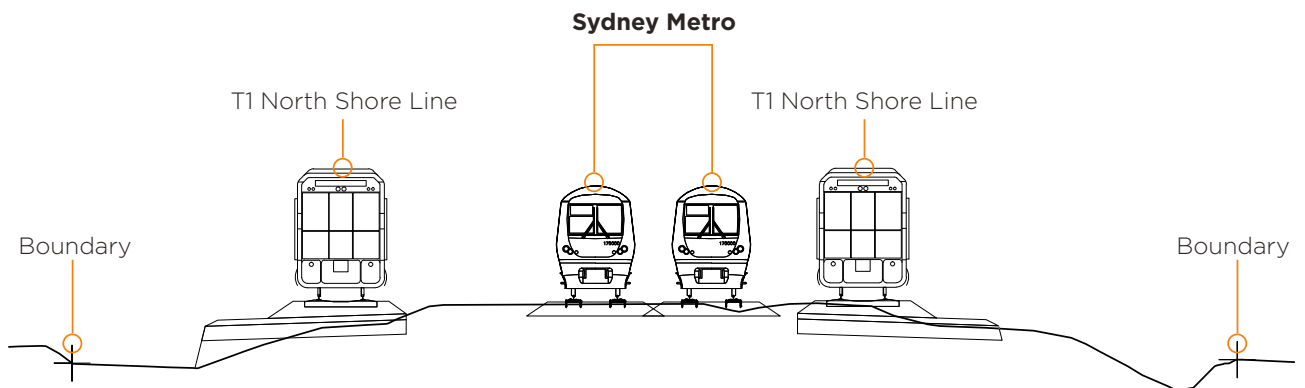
Indicative cross-section of metro tracks and T1 North Shore Line tracks
